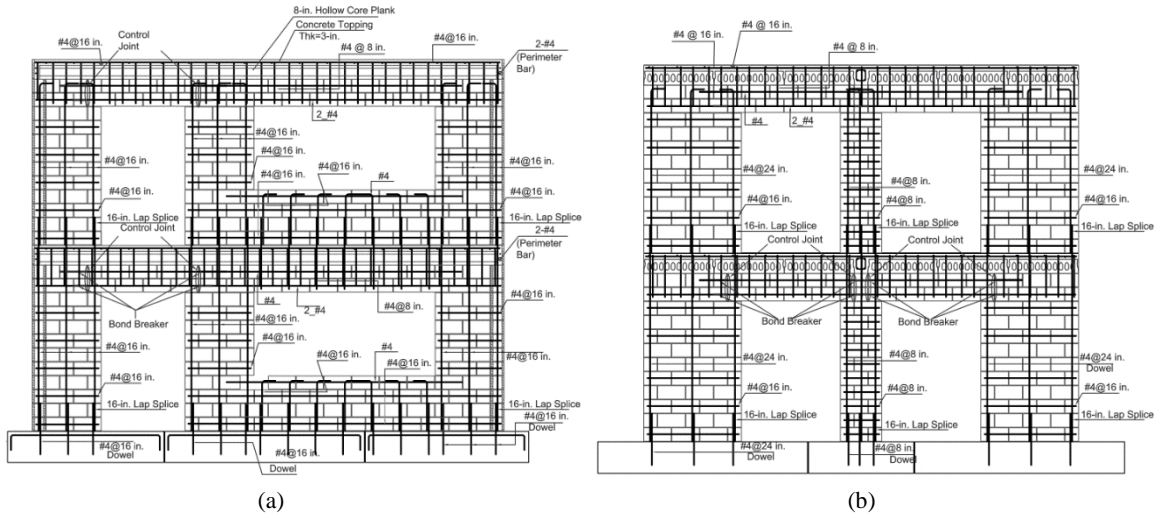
Reinforcing details: a) Interior wall b) Exterior Wall. (1 in. = 25.4 mm)
